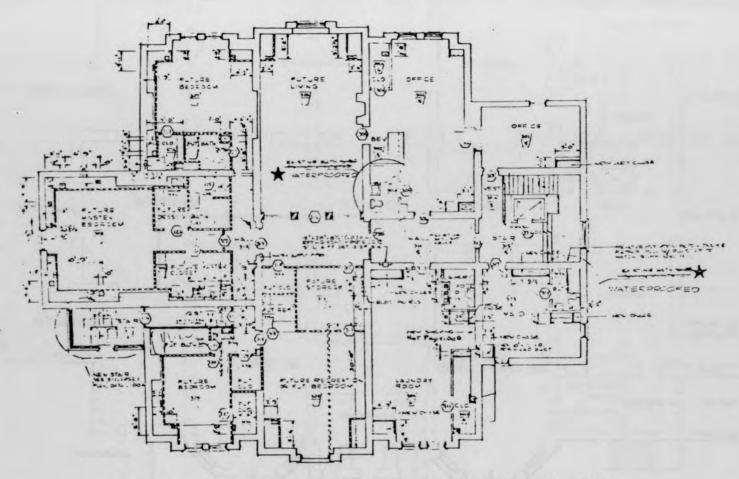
Proposed Third Floor Plan in 1973 Allocation
